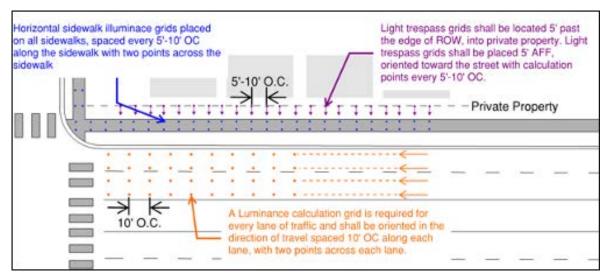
Roadway, Sidewalk, and Light Trespass Calculation Grid Setup
